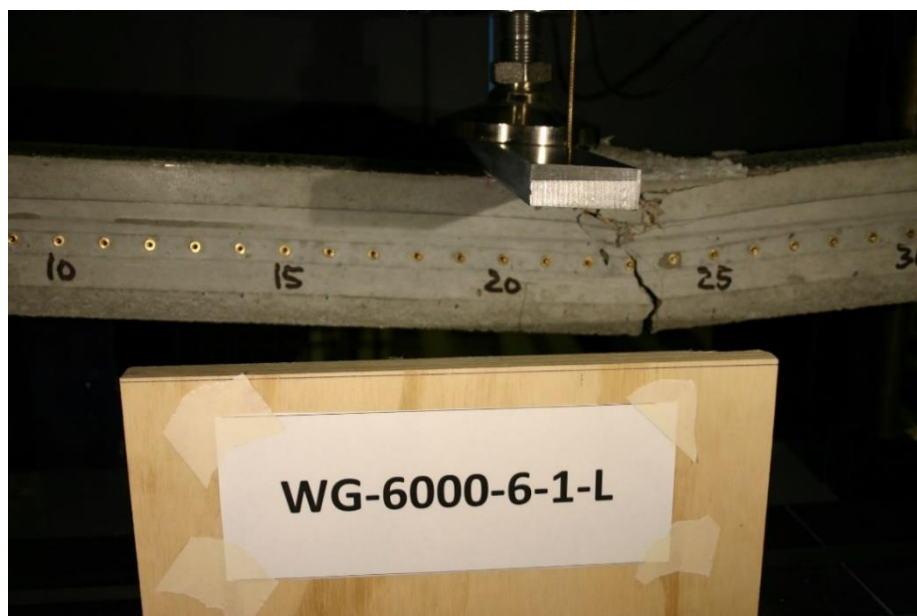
Picture of Failed Prism WG-6000-6-1-L
